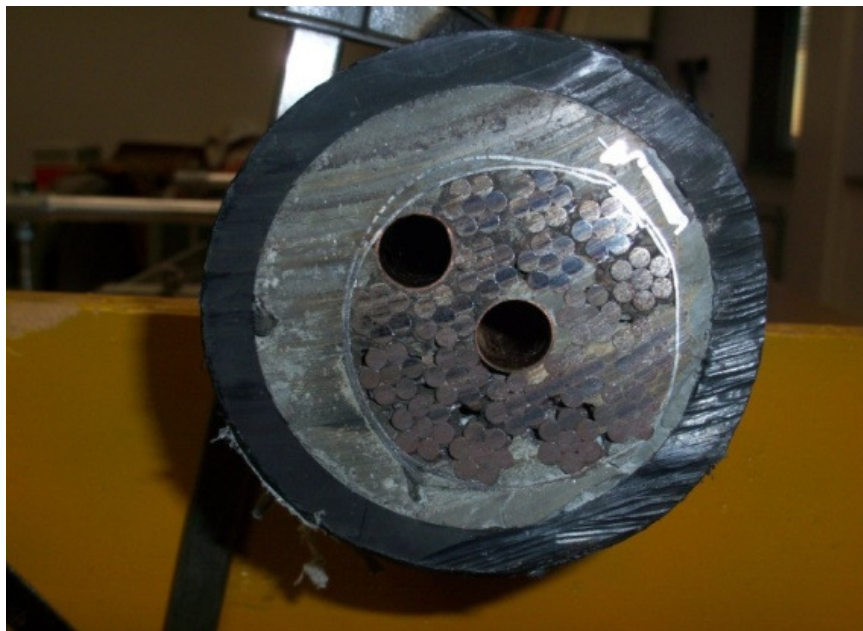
Bridge cable showing a bundle of prestressing steel strands covered with concrete grout and protective HDE cover.
